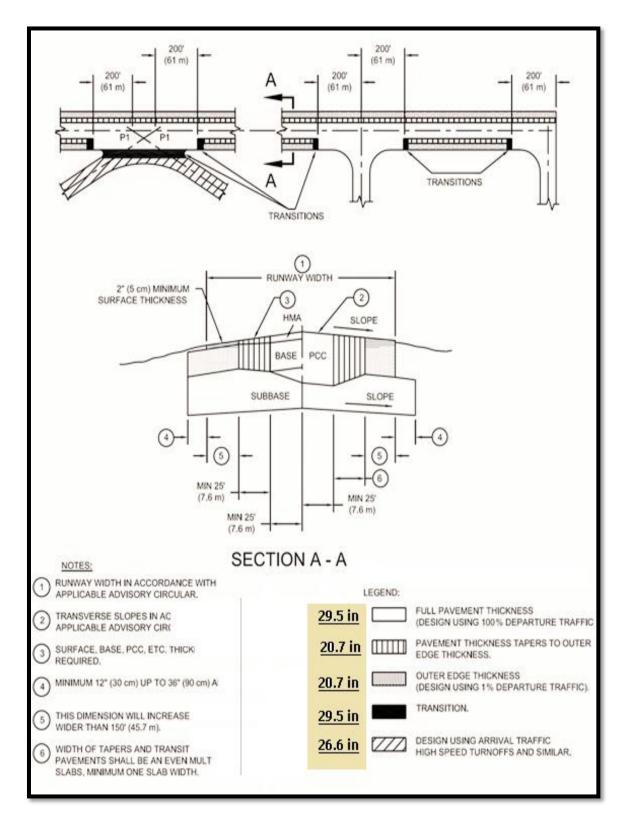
Typical Plan and Cross Section for KNIA Runway Pavement designed by FAARFIELD program
